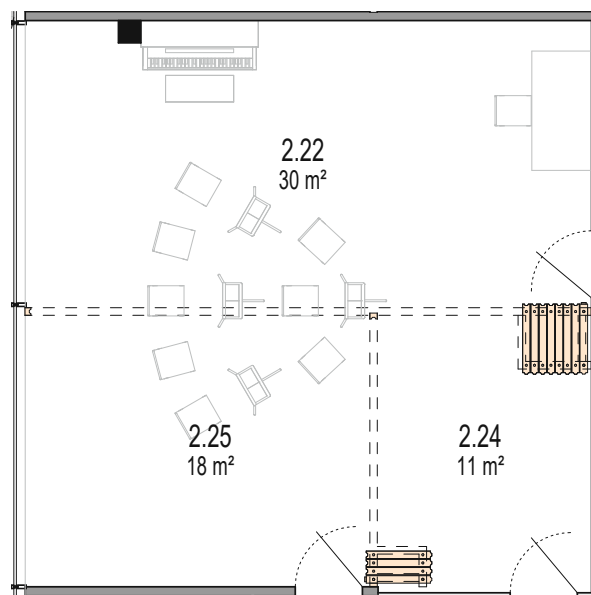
Flexible classrooms with open moveable walls-floorplan
